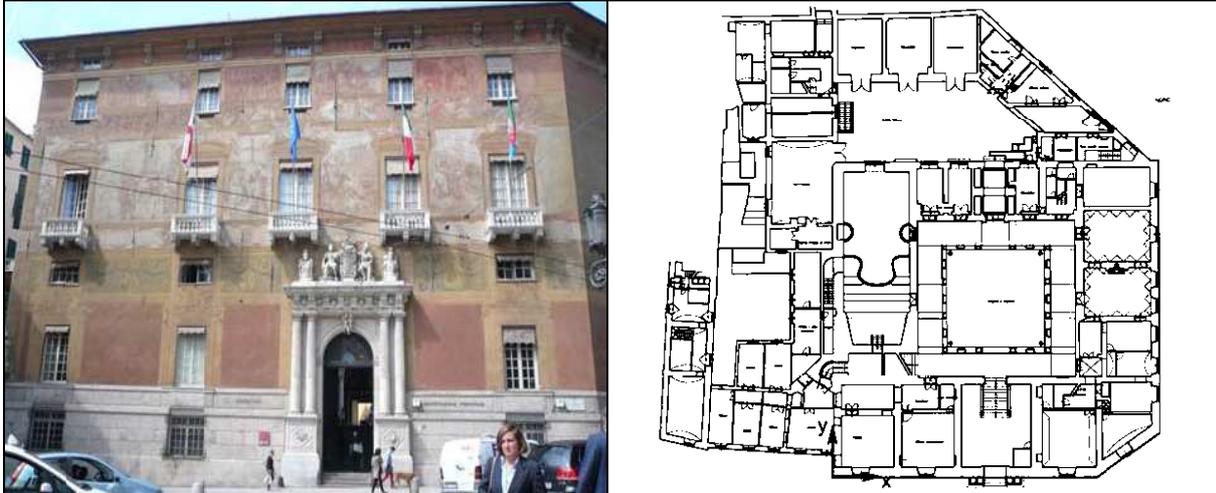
Overall view and plan configuration: SF = superimposed floor, AB = annexed building (archive number is used).
